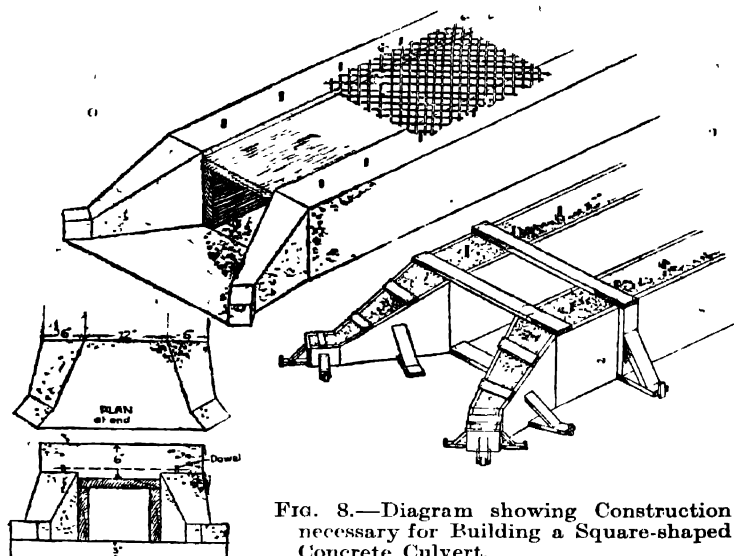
Diagram showing Construction necessary for Building a Square-shaped Concrete Culvert.
